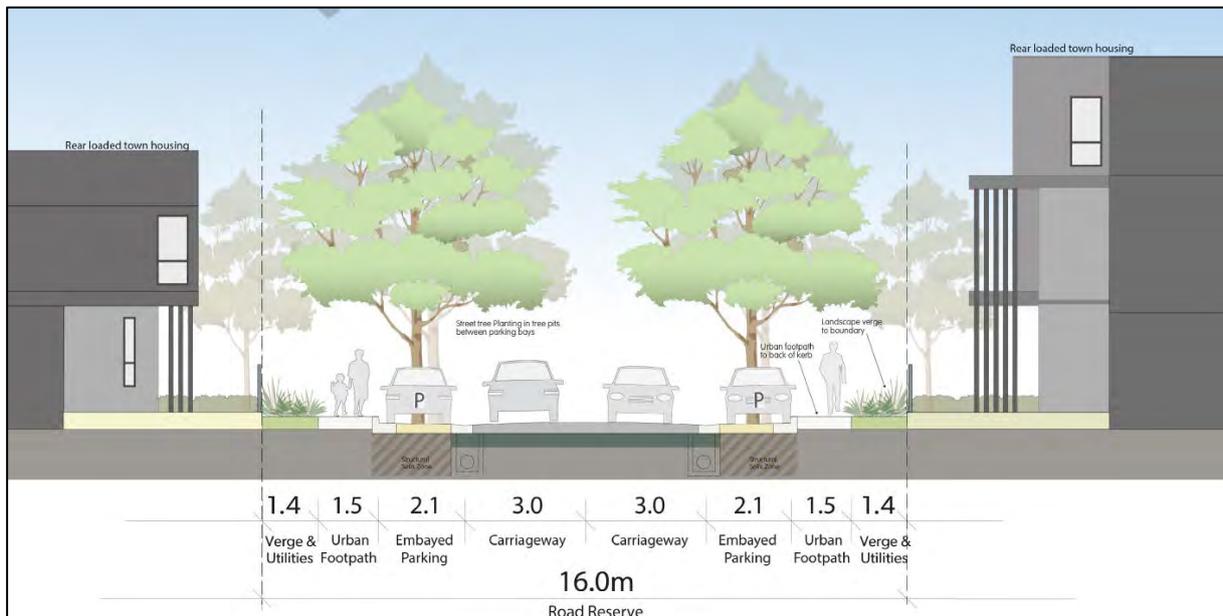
Rear-Loaded Urban Shade Local Access Street Cross-Section
